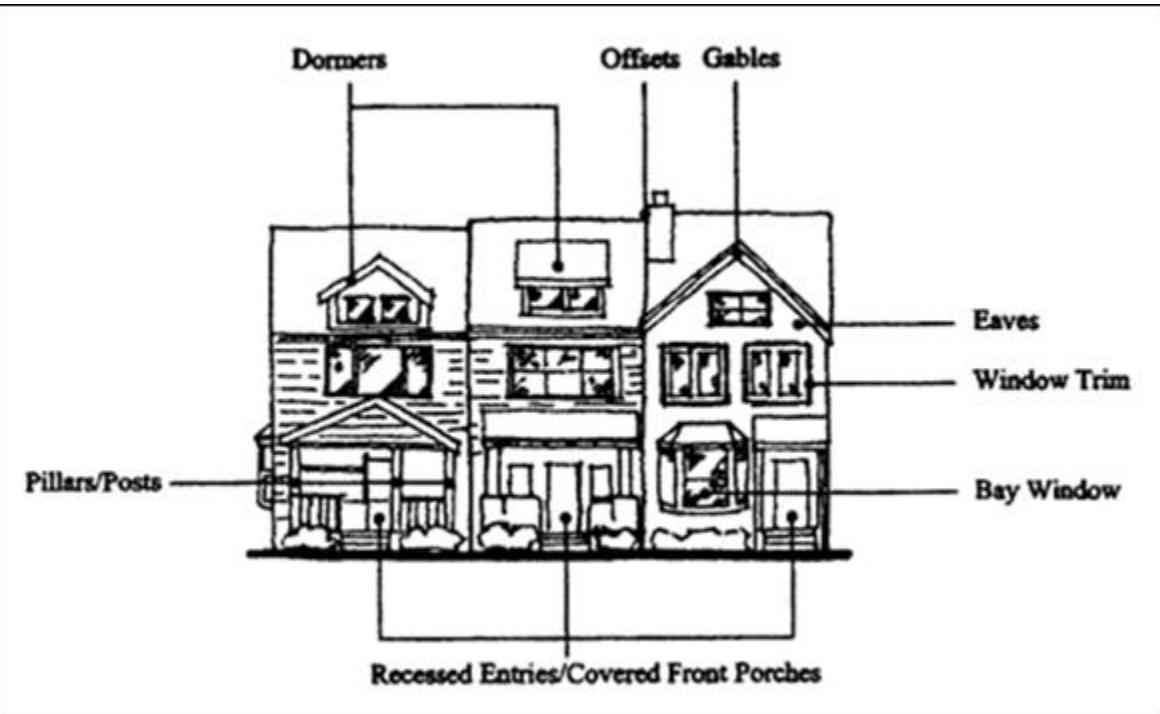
Example of Architectural Details—Townhomes
